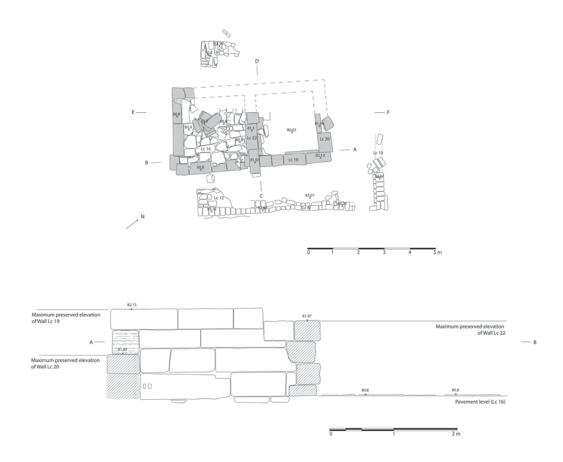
Groundplan and section-plan of the structural remains (© Belgian Archaeological Mission to Elkab).
